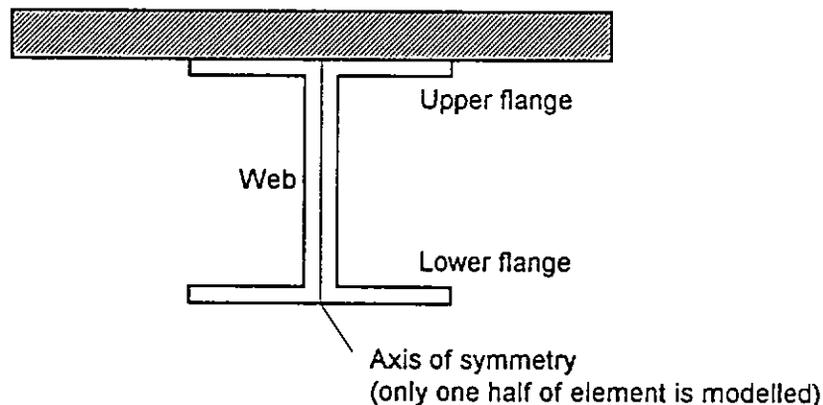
Sketch of Steel Section and Floor Slab (not to scale)
